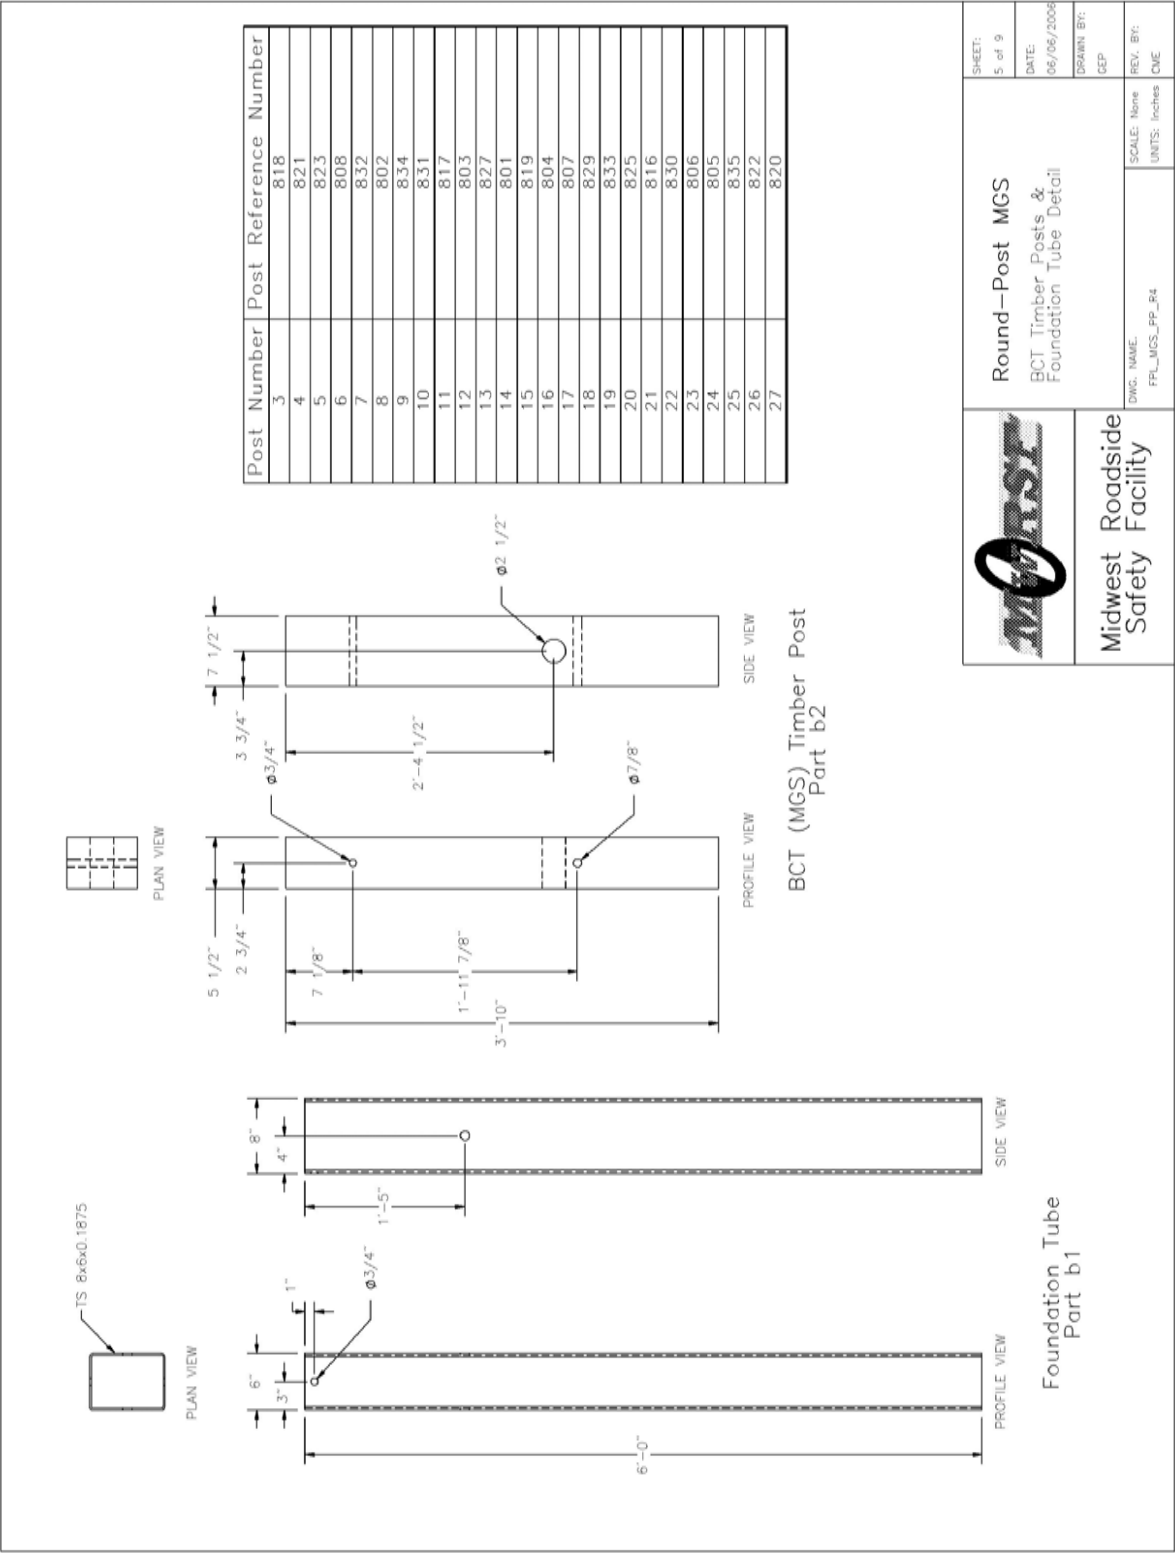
MGS Round Post Ponderosa Pine English Details – Anchor Post Detail
